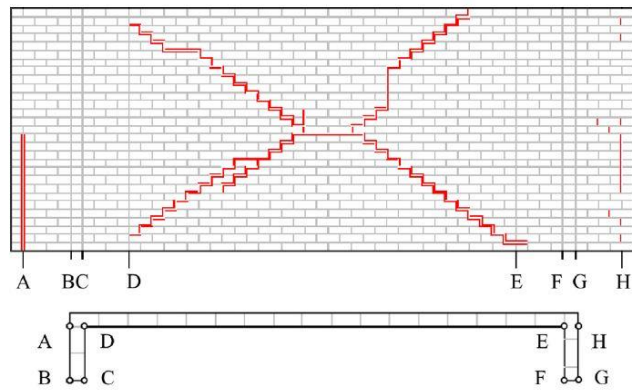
Damage pattern of the out-of-plane loaded masonry wall at the end of the test (Griffith and Vaculik 2007).
